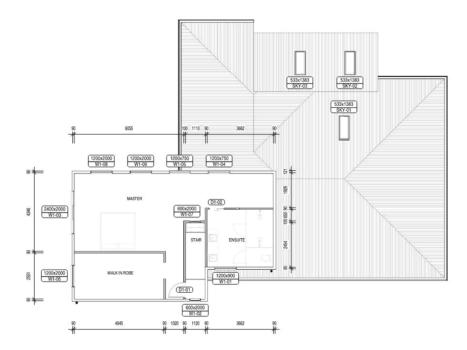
Excerpt from submitted proposed upper floor plan (Source: Formation Design & Drafting).
